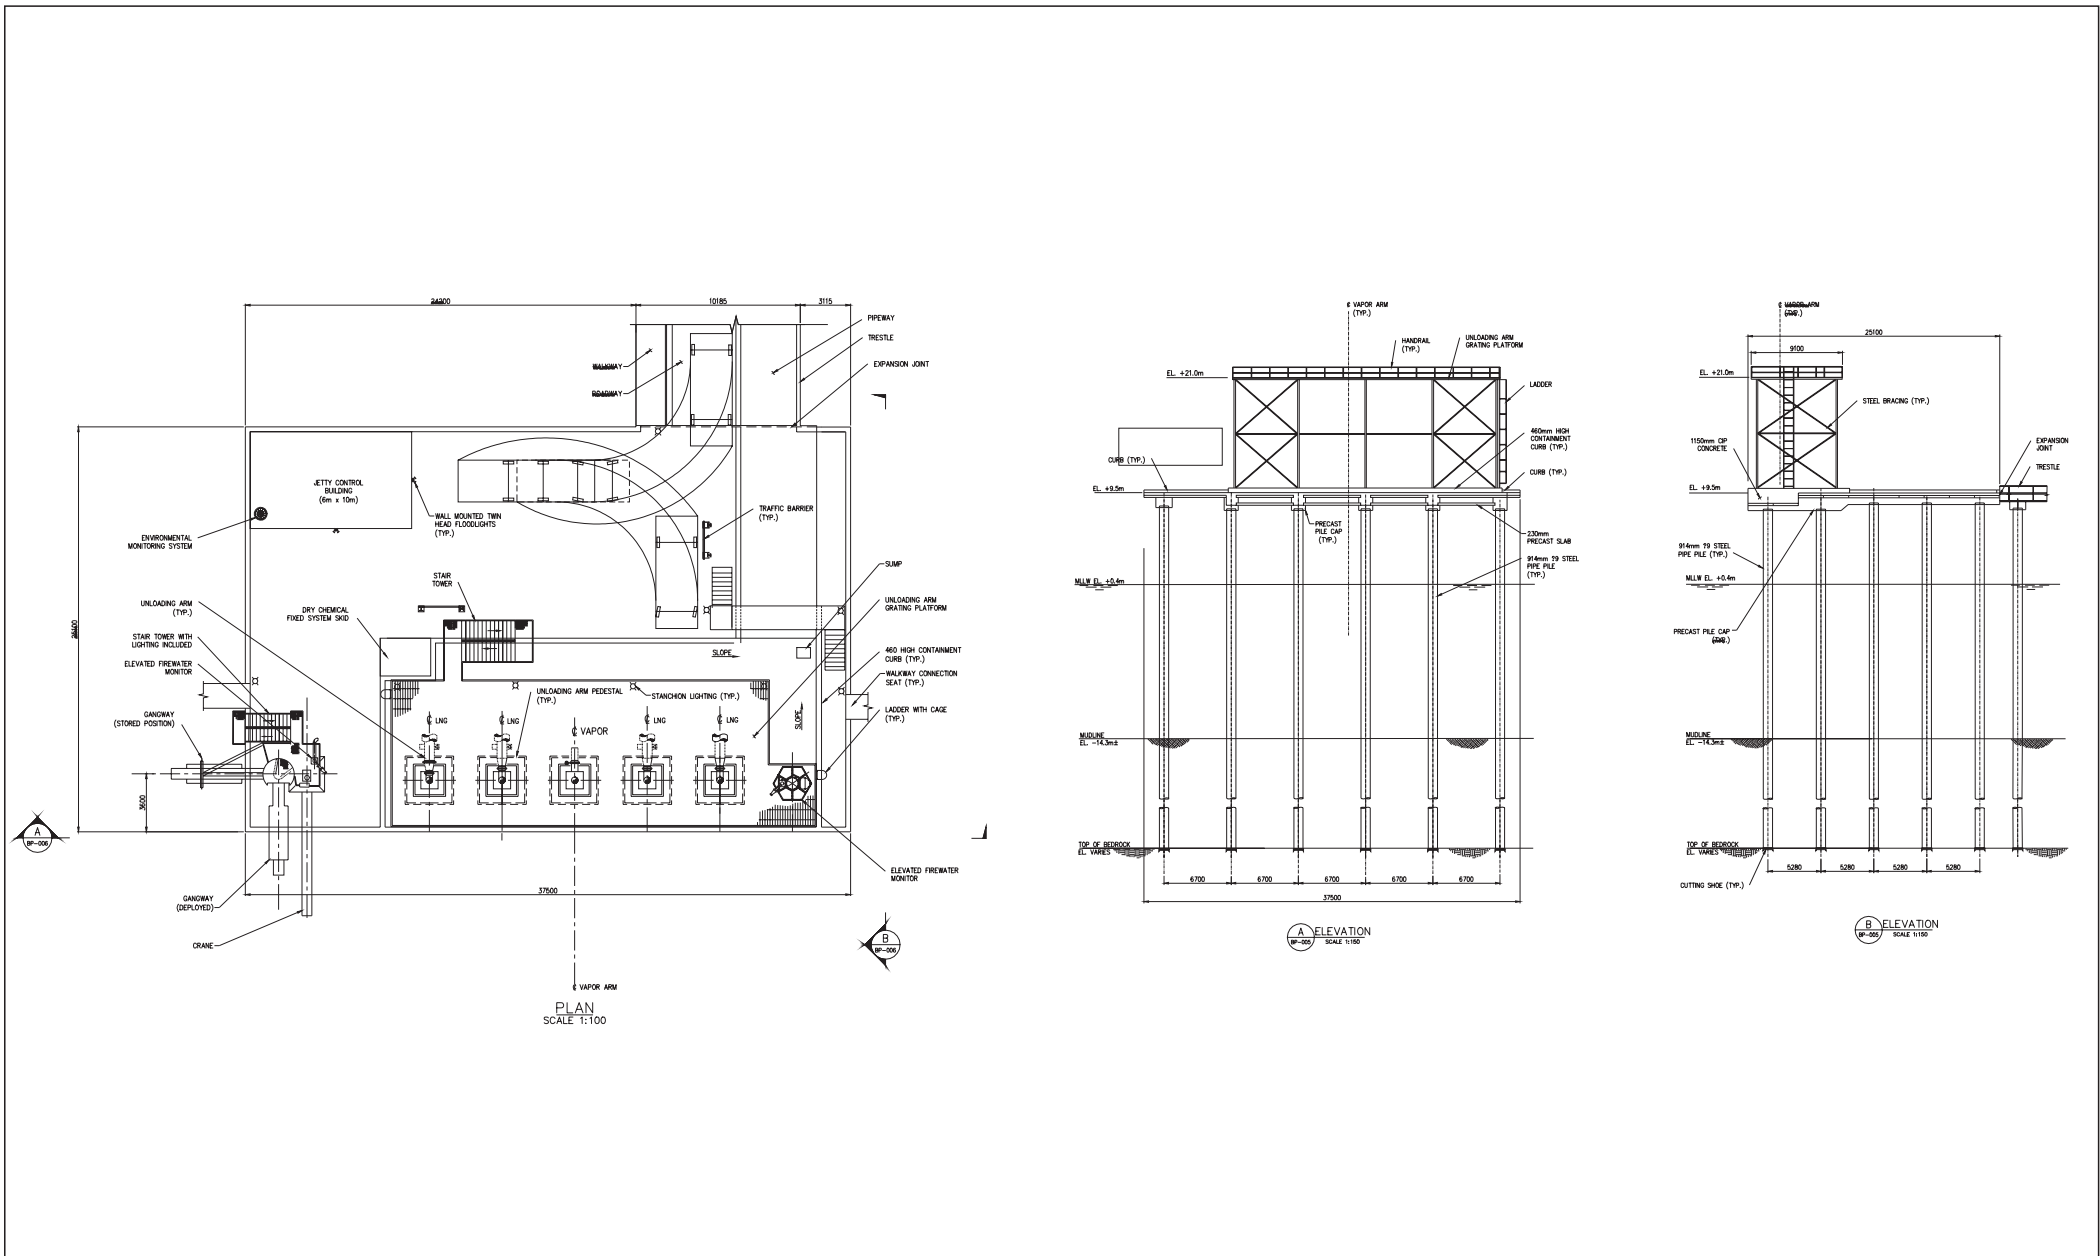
Conceptual Plan of the Unloading Platform for the LNG Jetty at Black Point Terminal
